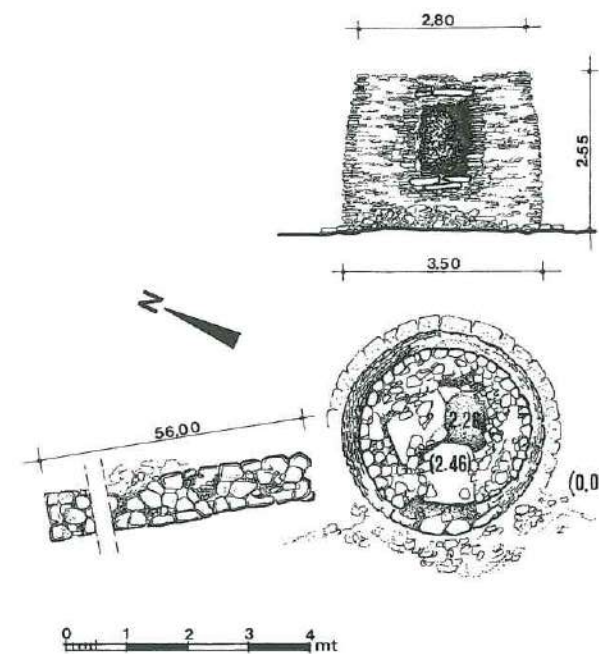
Tomb MKDiii/T9: plan and elevation.
